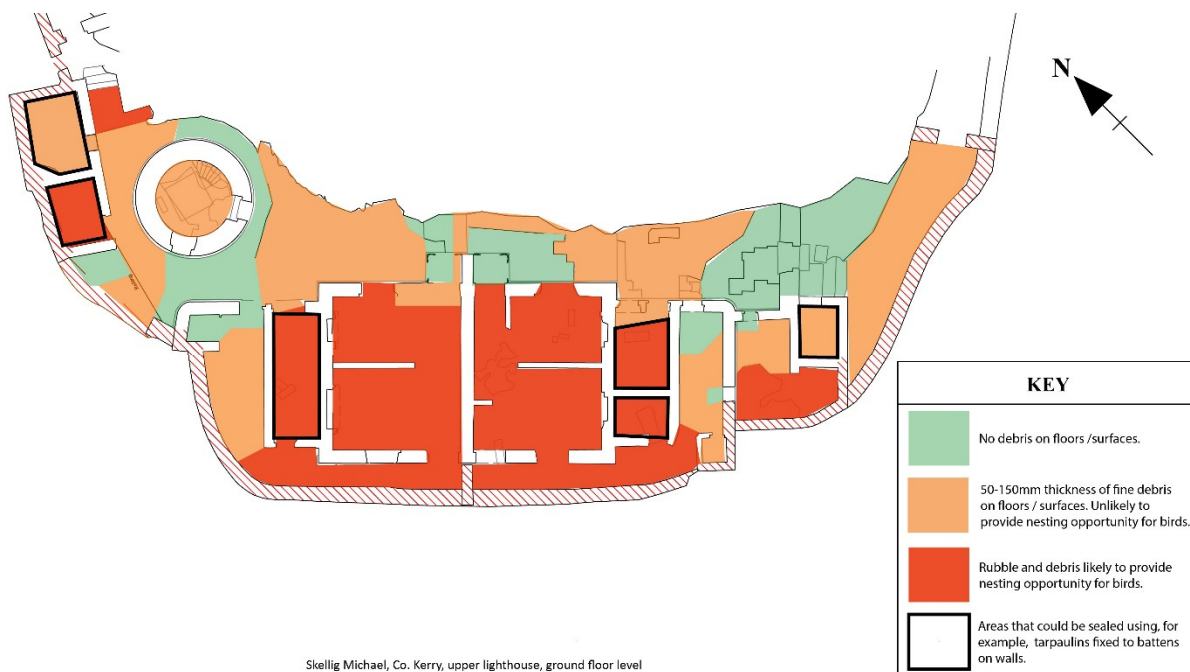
Ground Floor Plan of the Upper Lighthouse showing possible locations of birds' nests (Alan R. Hayden)
